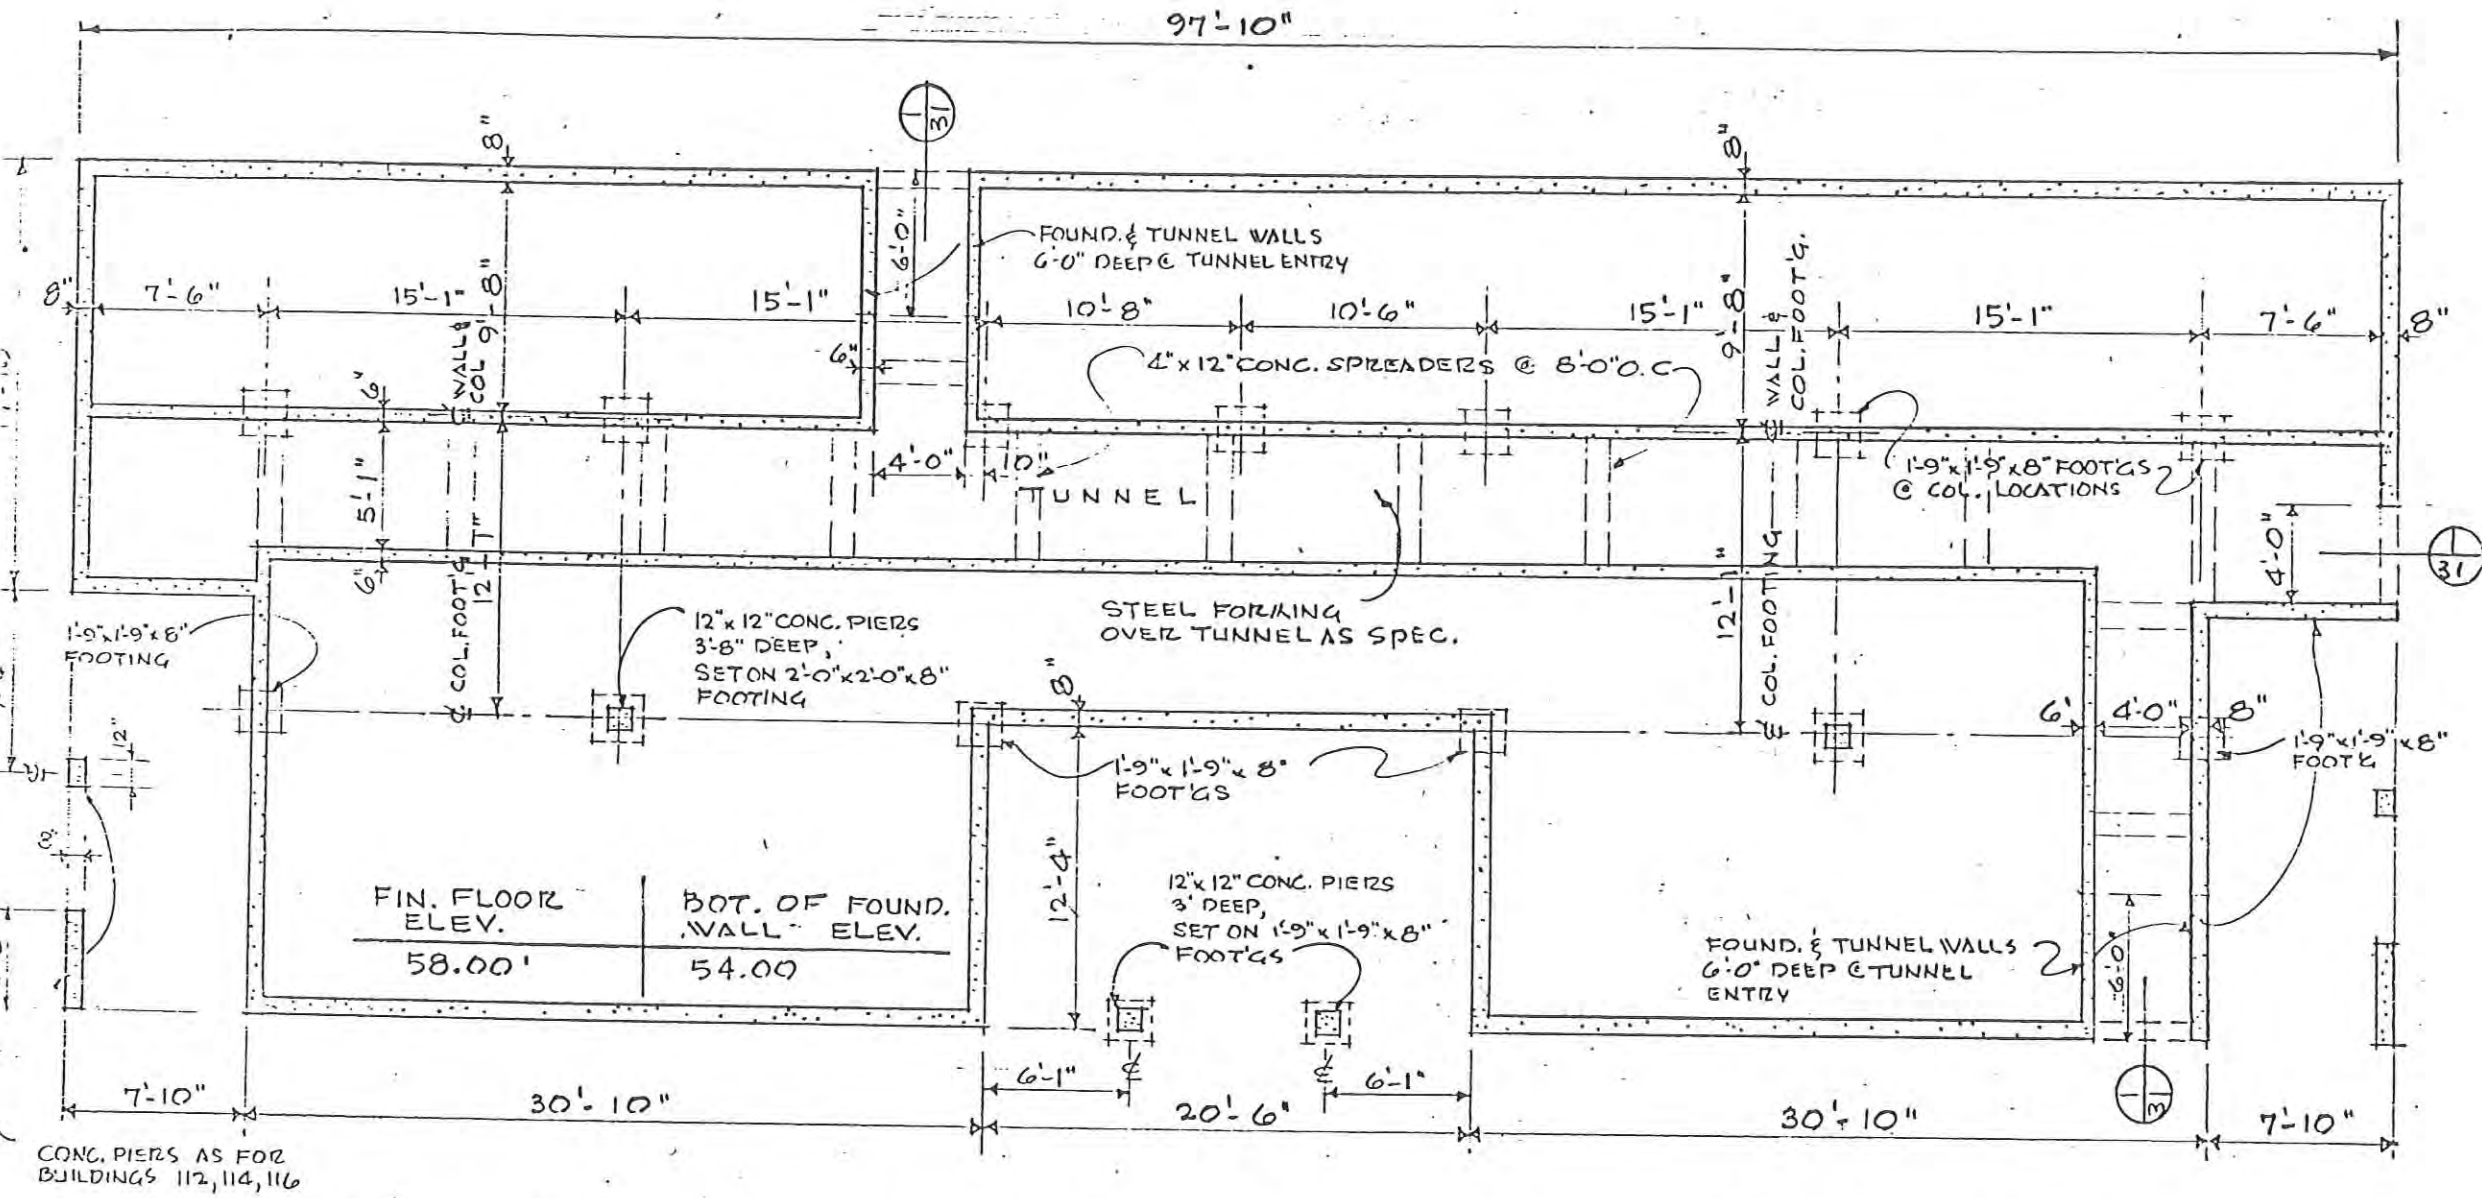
ORIGINAL FOUNDATION PLAN
